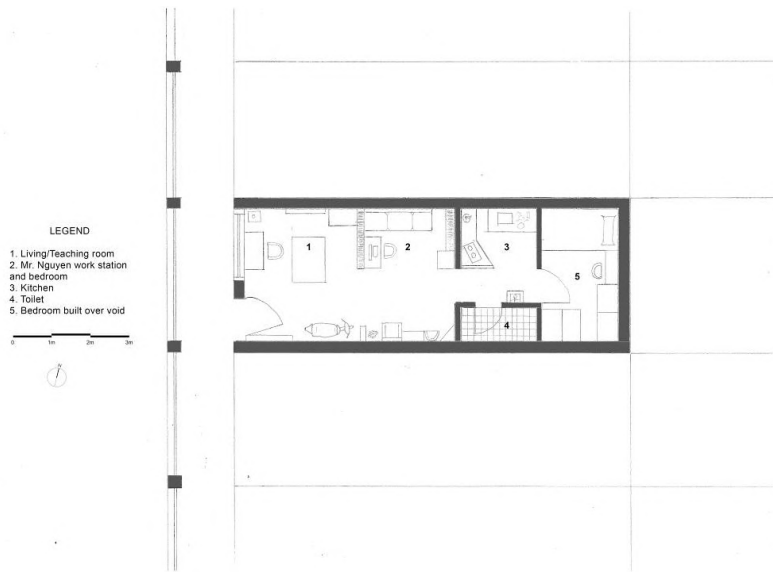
Current floor plan (Produced by Loc Tran, 2018)
